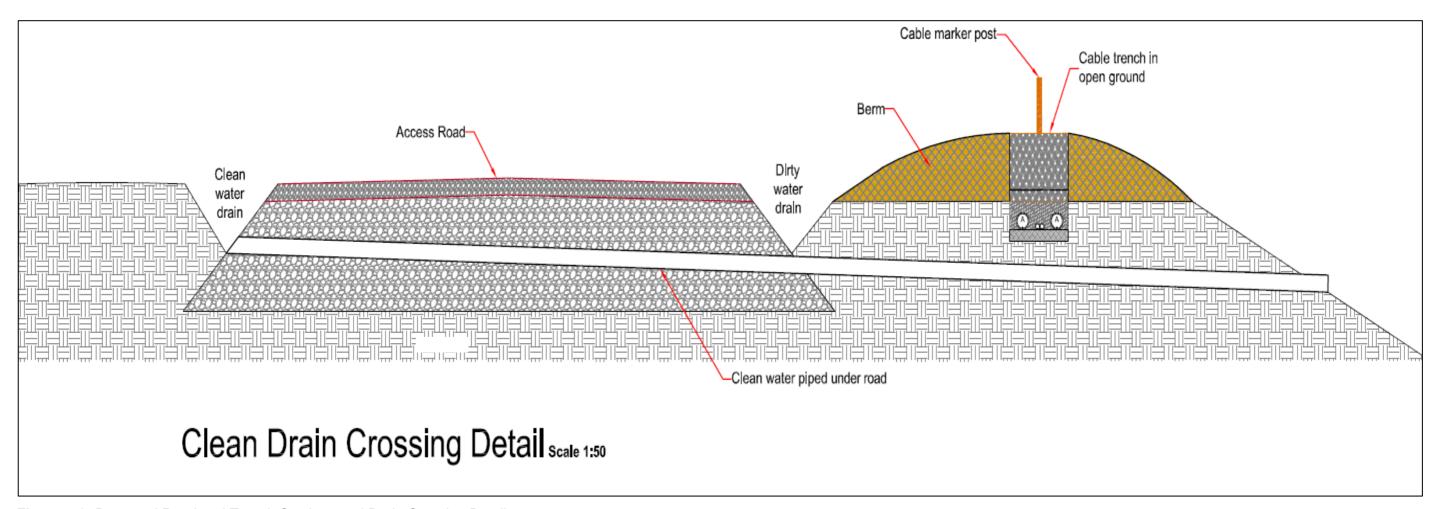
Proposed Road and Trench Sections and Drain Crossing Details
